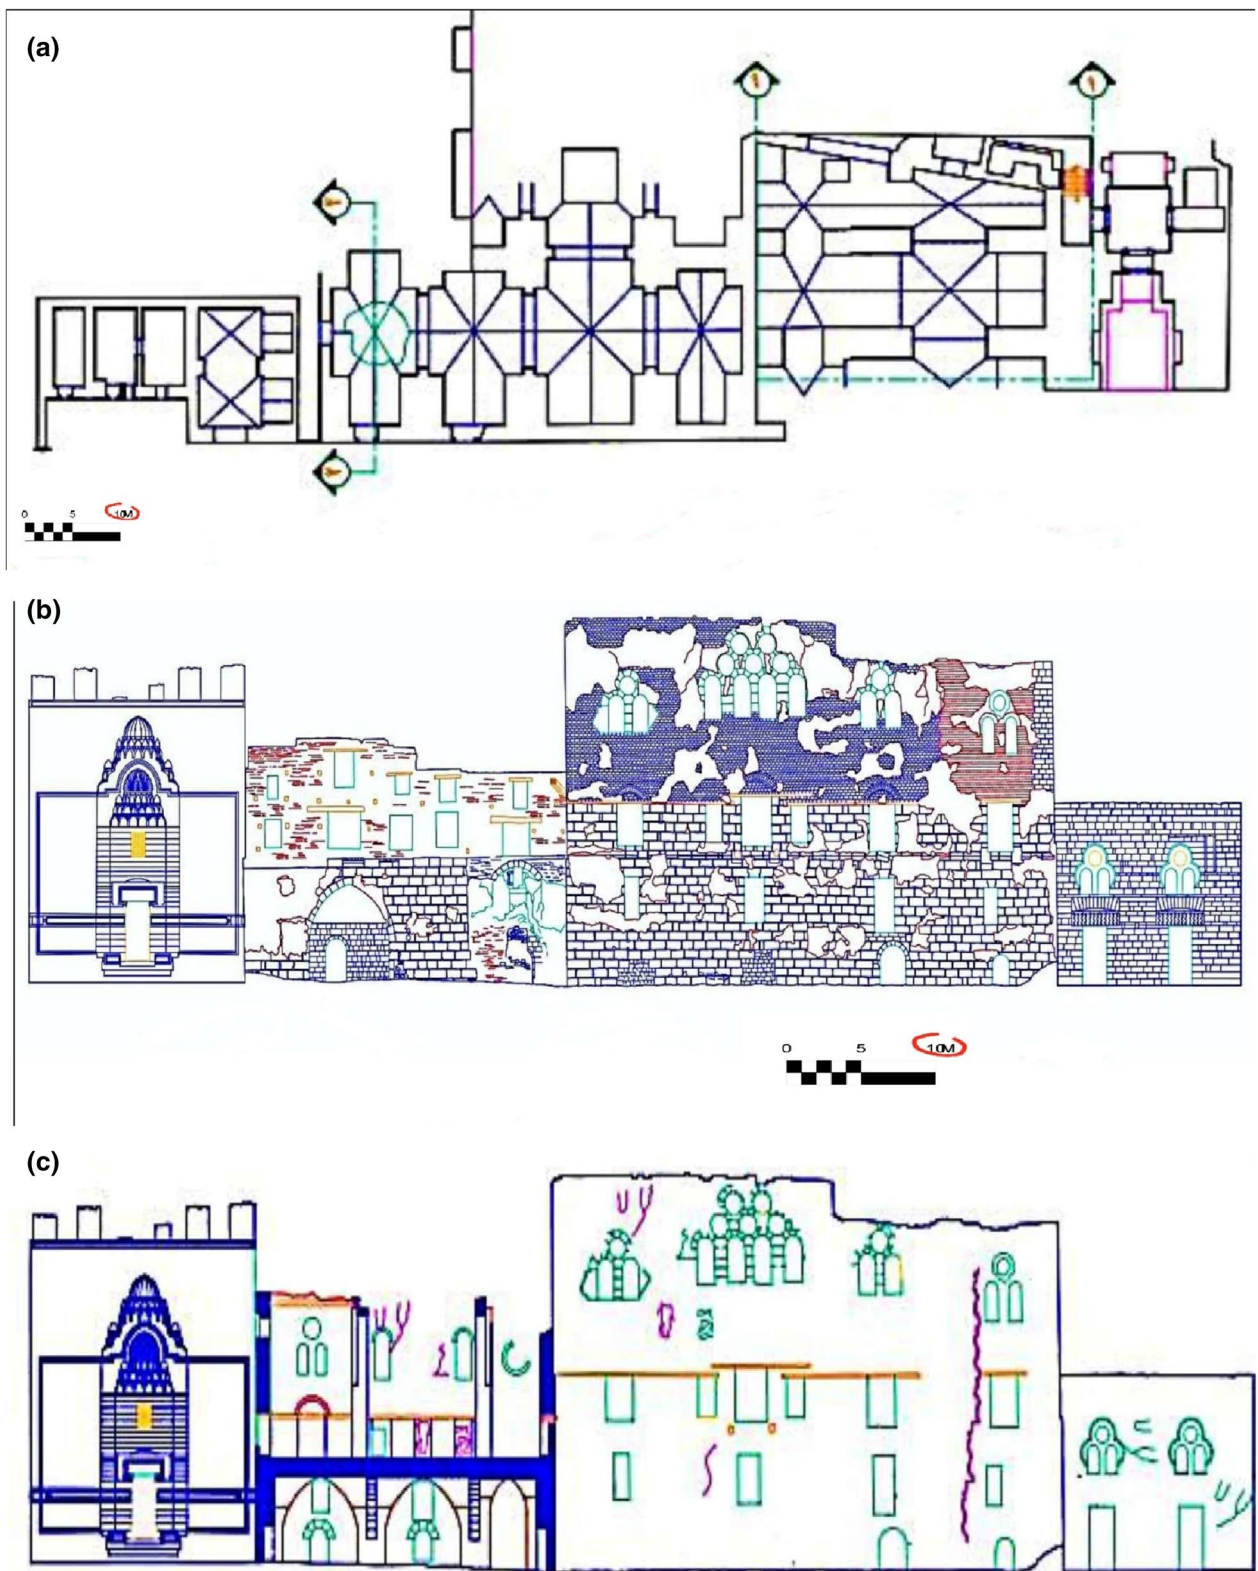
a. The plan and layout of Qasr Yahbak, b. The elevation of the main façade of the palace. c. the degradation map of the main façade with the locations of structural cracks and other out of plane deformation patterns
